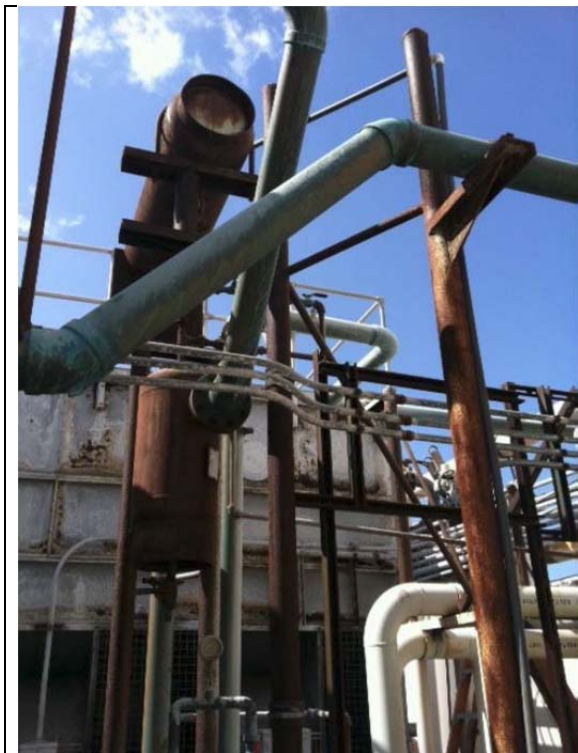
Galvanized and copper piping near BAC chiller unit and bldg 653- Industrial Southeast
